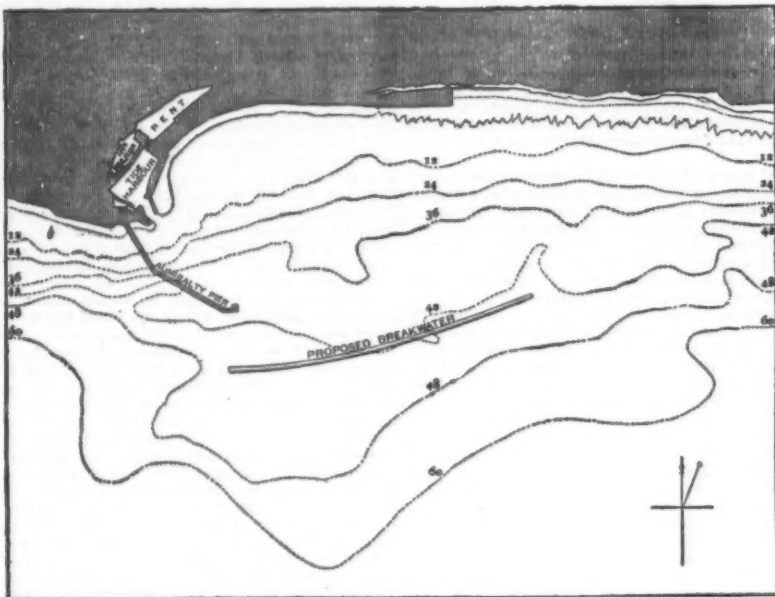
DOVER PIER AND PROPOSED BREAKWATER.
